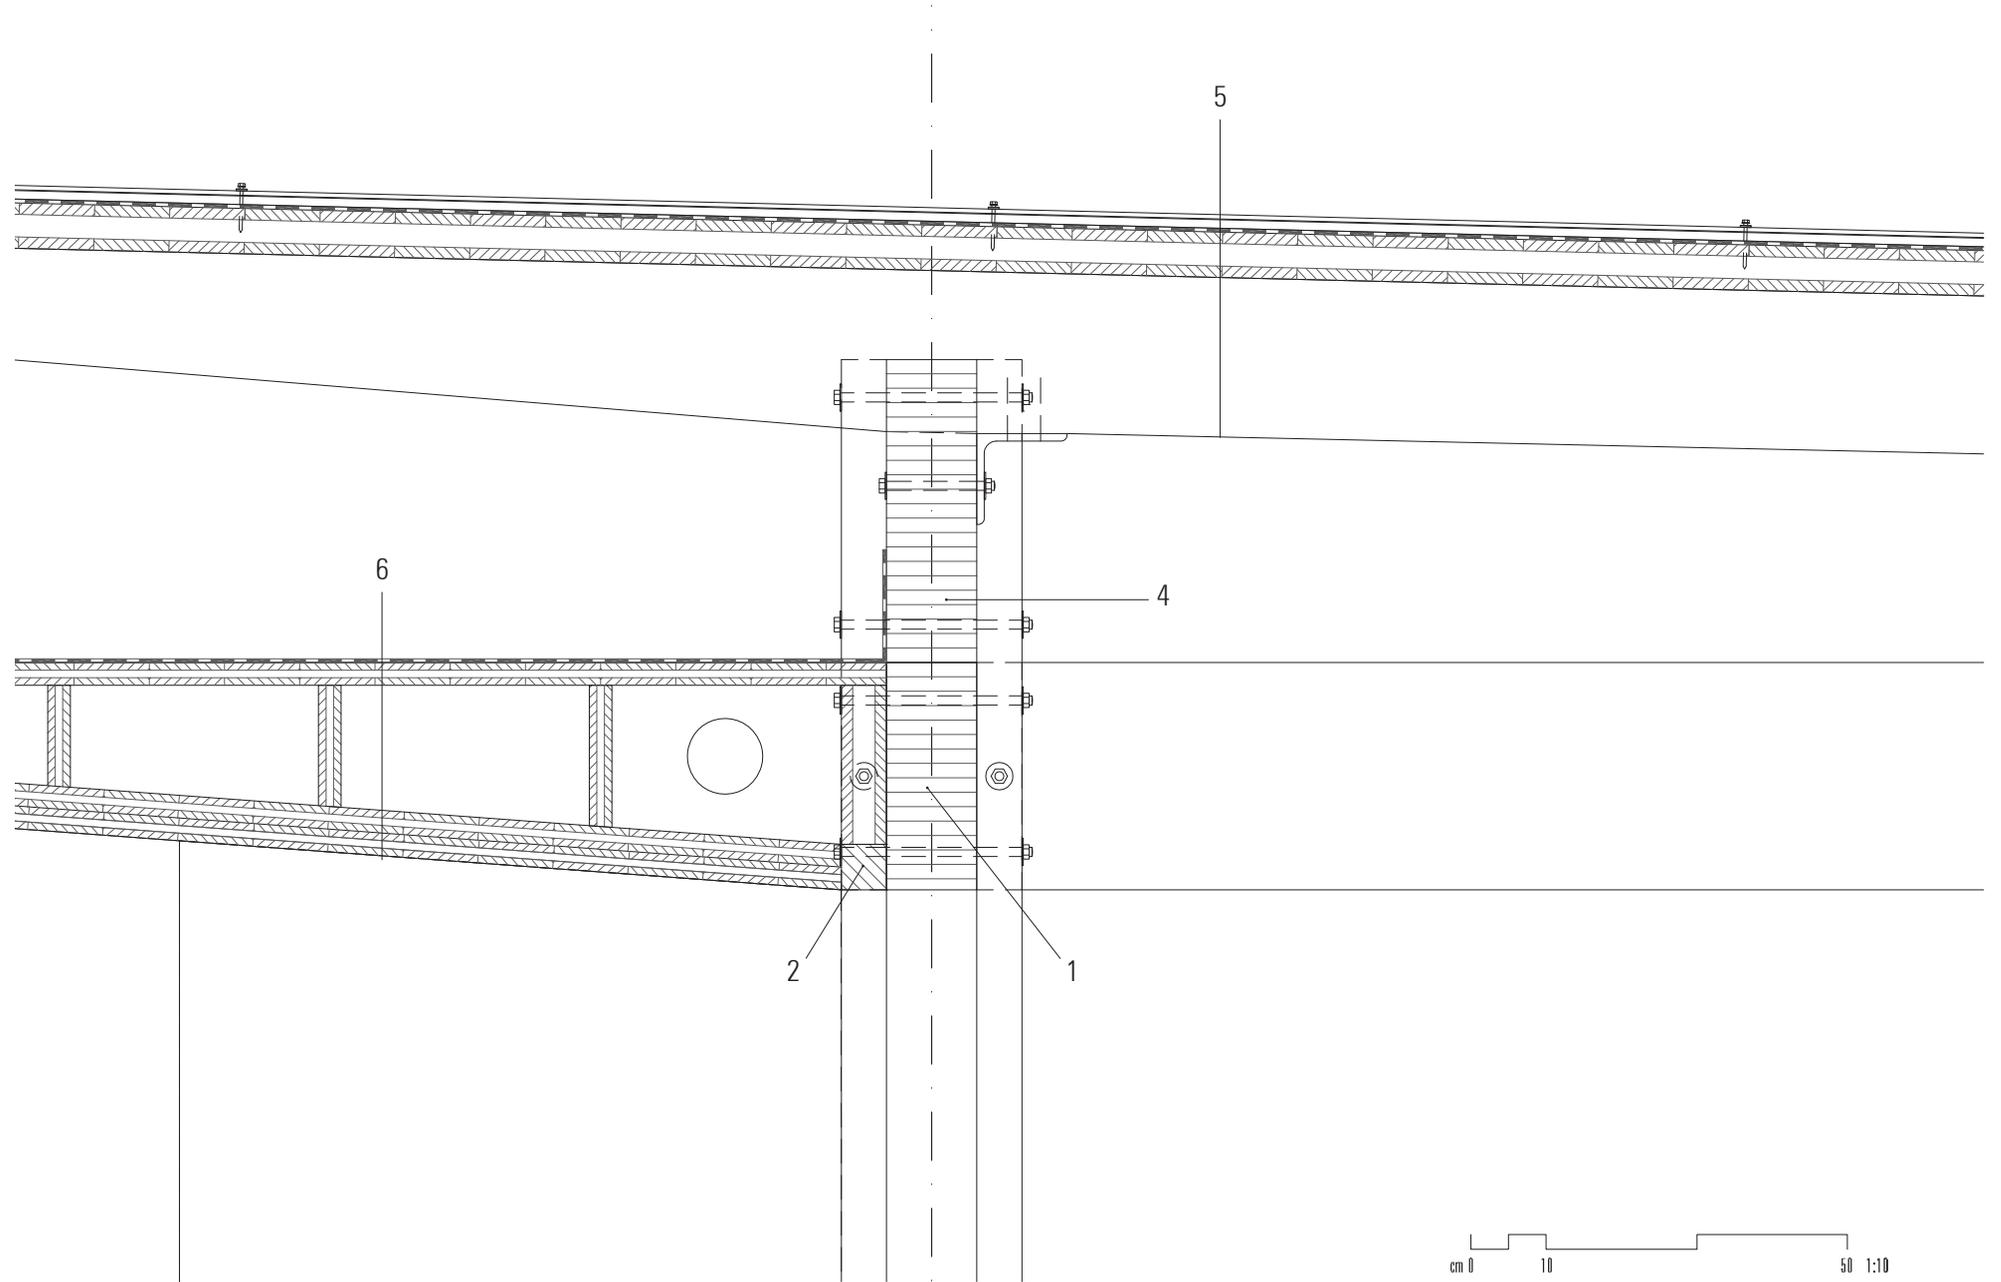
| DETAIL 2 | DETAIL 3 | DETAIL 4
